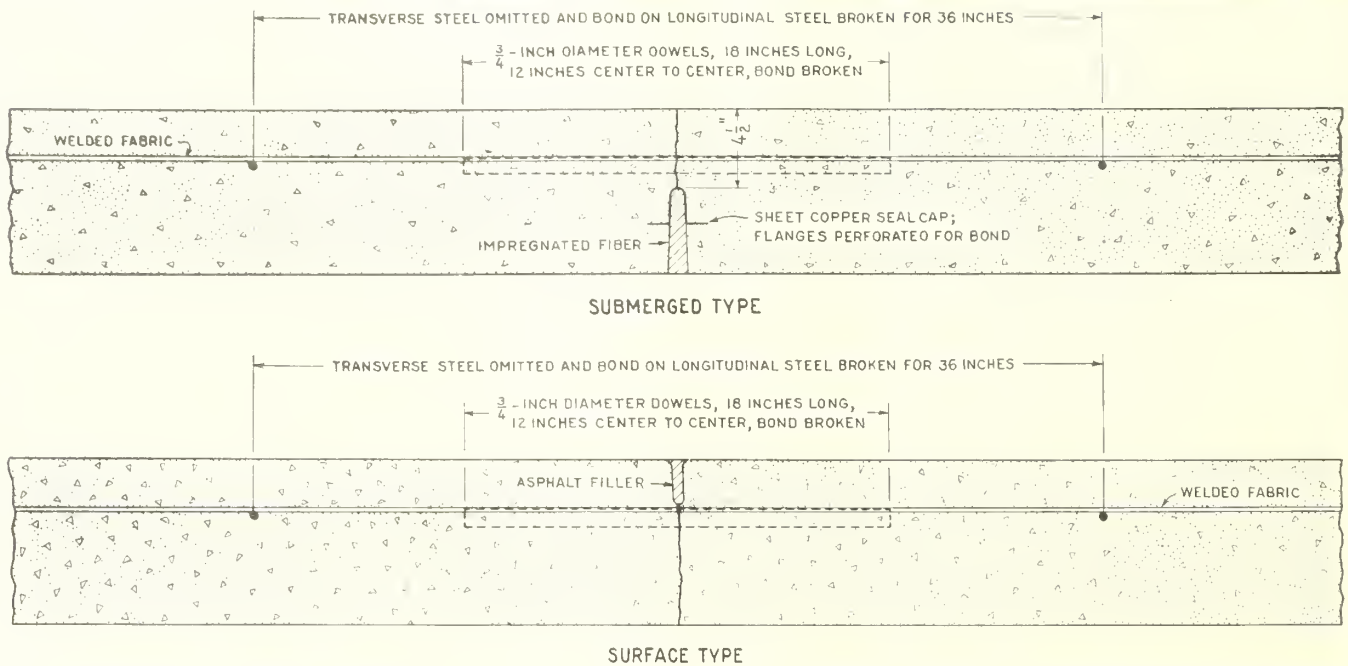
DETAILS OF WEAKENED-PLANE JOINTS. DOWELS OMITTED IN JOINTS IN ONE-HALF THE LENGTH OF EACH SECTION.
